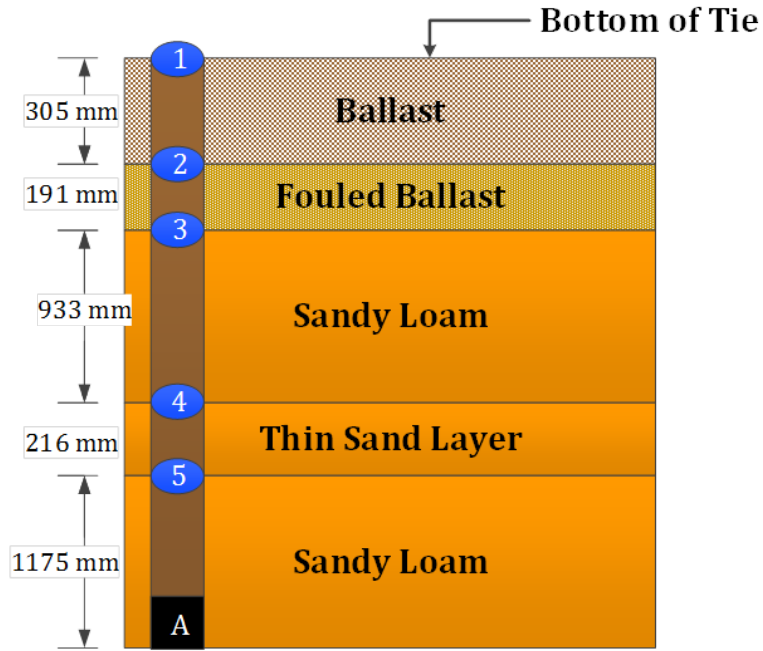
Substructure Layer Profile for Upland Street 15 ft From the North Abutment (Track 3)
